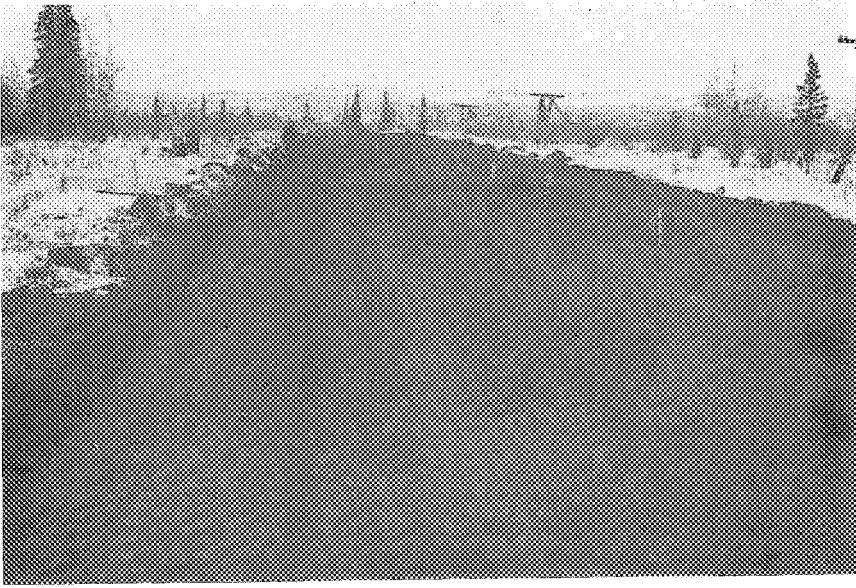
Completed winter test sections. View to west from east end of 2" insulation section.
